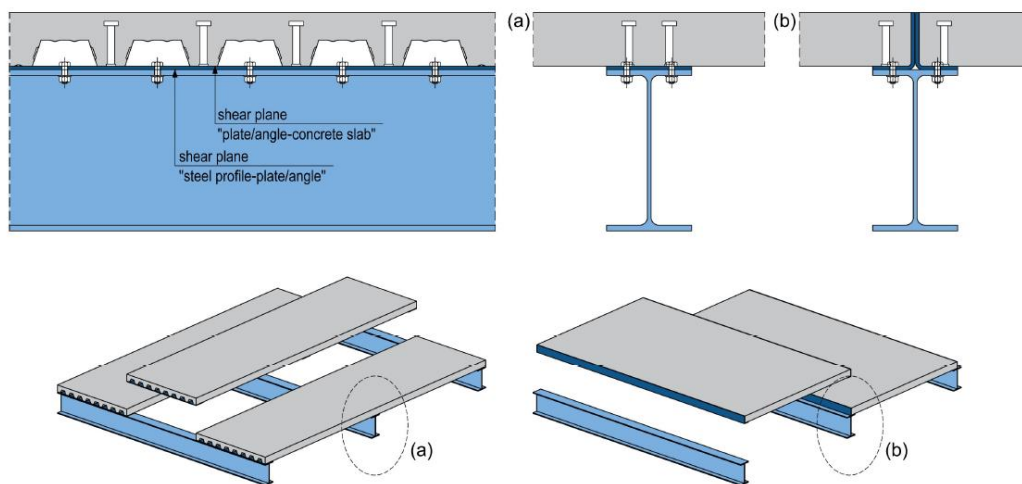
Concept of demountable shear connection in composite beams (adapted from Jakovljević et al [10]., PhD thesis).
